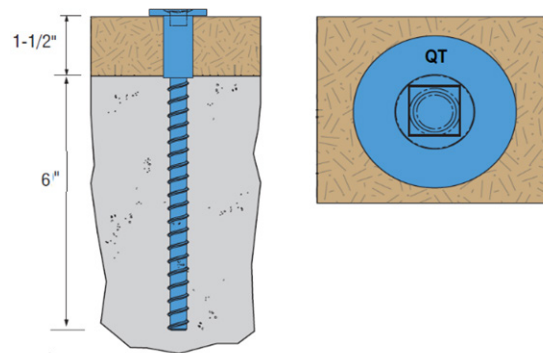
SPArtan Sill Plate Anchor Section and Plan Views
